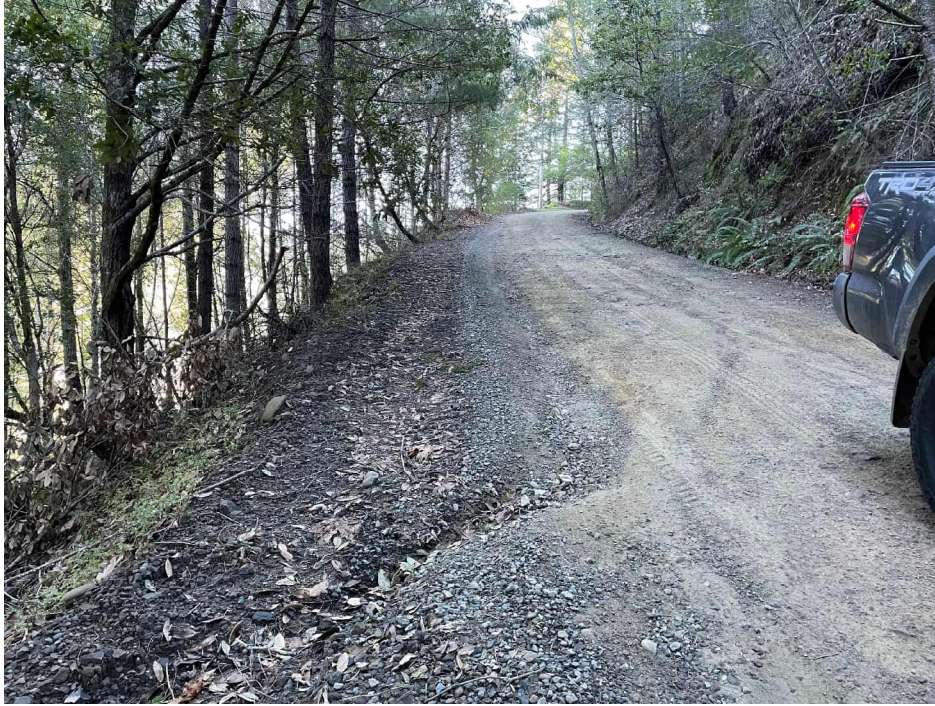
RP 5. Milky Way Loop – 14-16' dirt/gravel road width with waterbar. Image shown facing south; towards the subject parcel.
